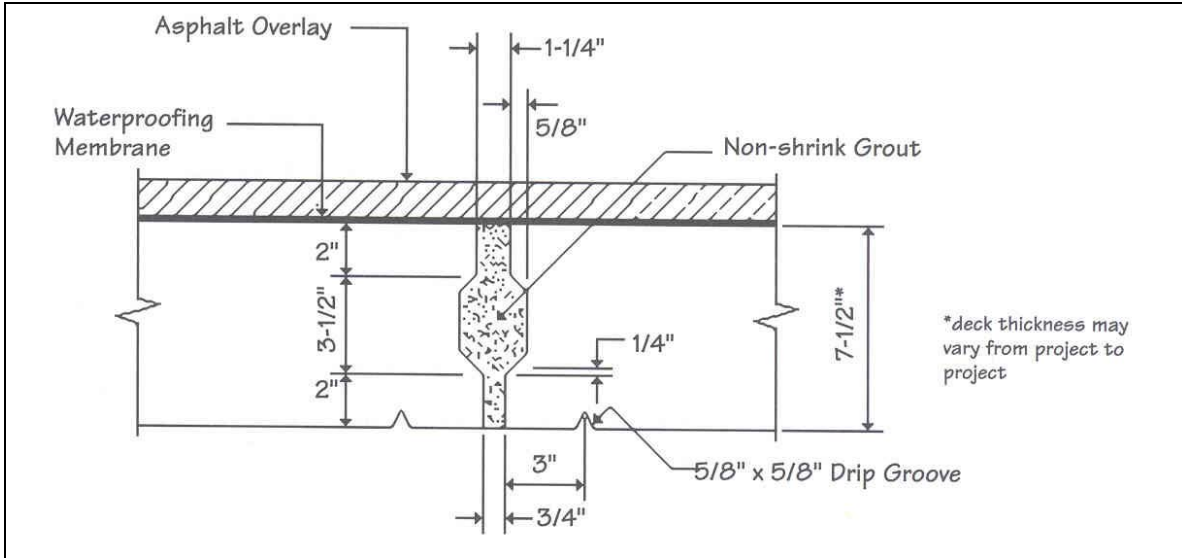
Typical joint detail with asphalt overlay (The Fort Miller Co. Inc., 1998)
